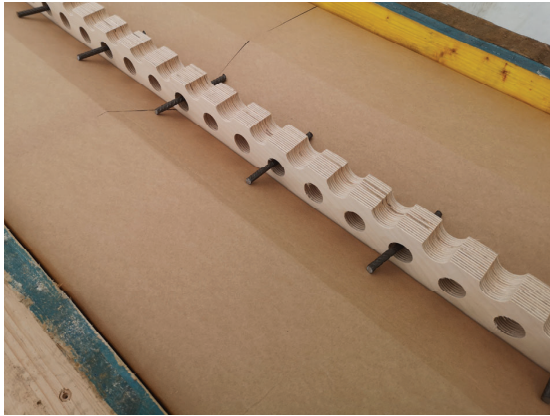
Specimen with carboard bloks and rebars positioned previously the concrete pouring of 50 mm thick upper slab. In the photograph, the steel mesh has not yet been placed.
